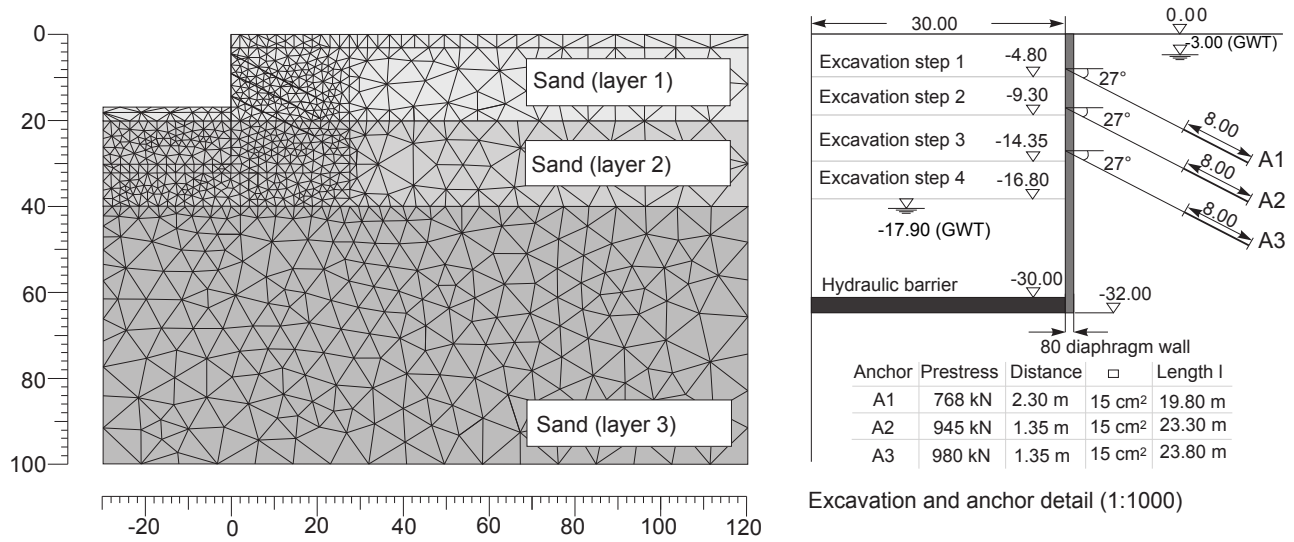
Excavation in Berlin sand: plane strain mesh (left) and geometry detail (right)
